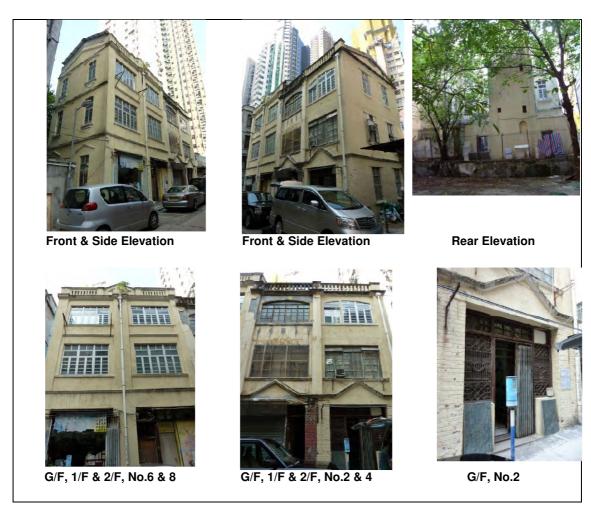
Site Photos of Yellow House (2-8 Hing Wan Street) (Source: Courtesy of Mr. C.M. Lee)
